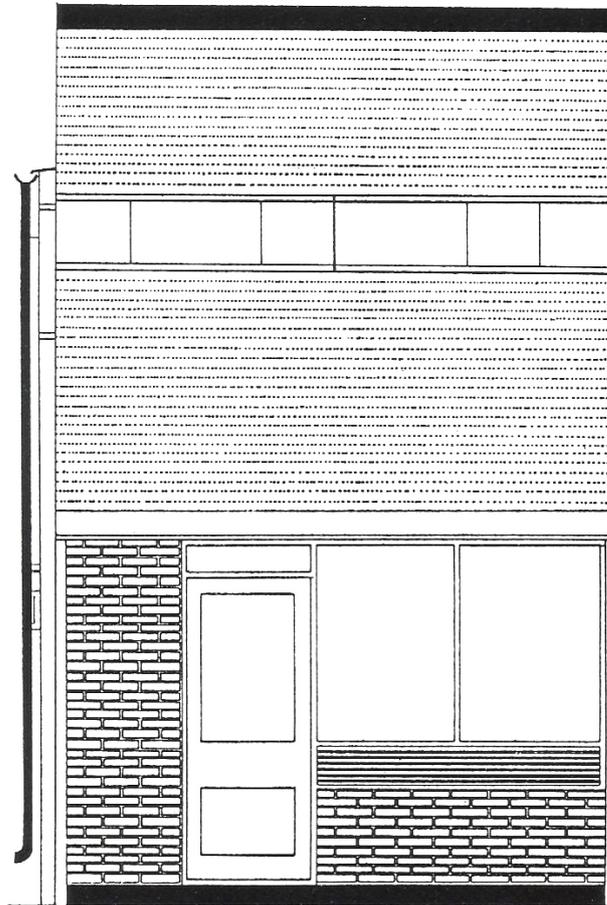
Elevation of the front façade of a standard dwelling in *Entrevías*.
